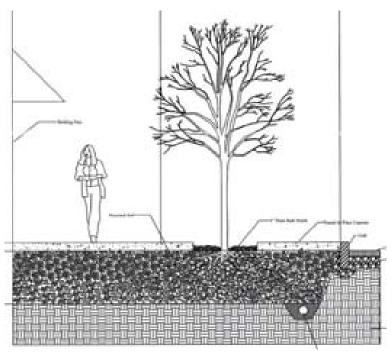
Structural soils provide void space for root growth and load-bearing for sidewalk
